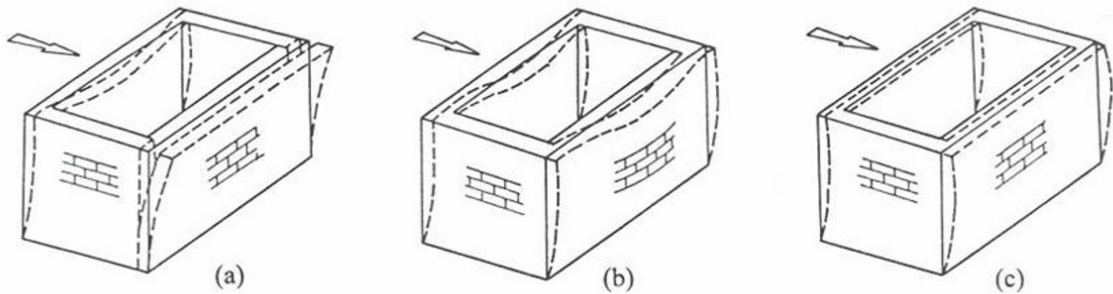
a) inferior wall-to-wall connection and no diaphragm, b) good wall-to-wall connection and ring beam with flexible diaphragm, c) good wall-to-wall connection and rigid diaphragm [17].
